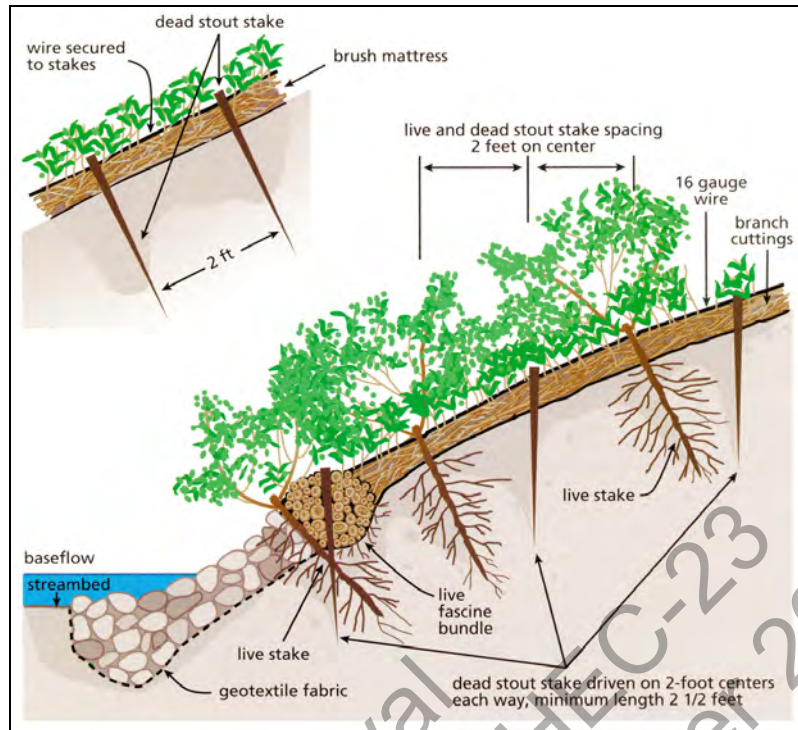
Details of brush mattress technique with stone toe protection.⁽⁵¹⁾
